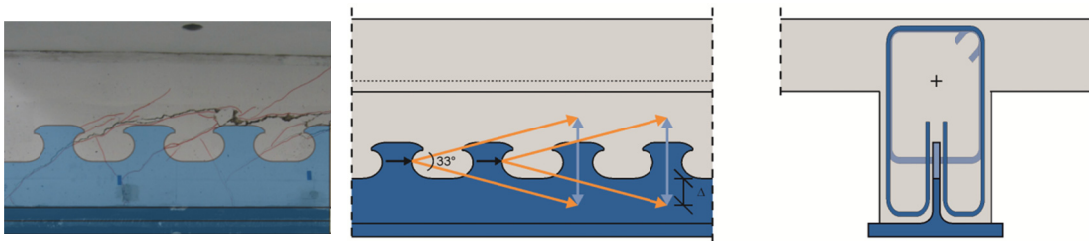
Failure mode vertical splitting: test specimen (left), strut-and-tie model (middle) and required stirrups (right).
